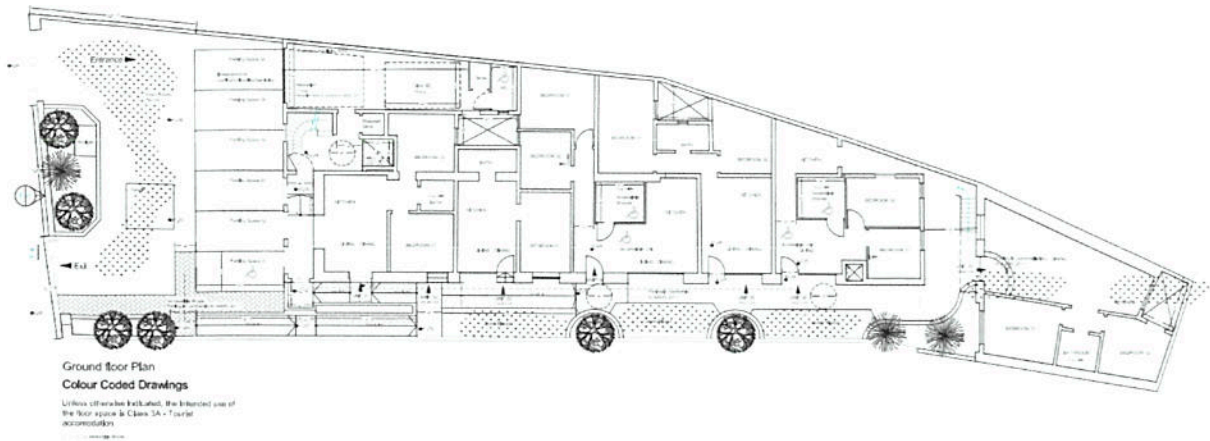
Proposed Ground floor plan – Touristic accommodation
